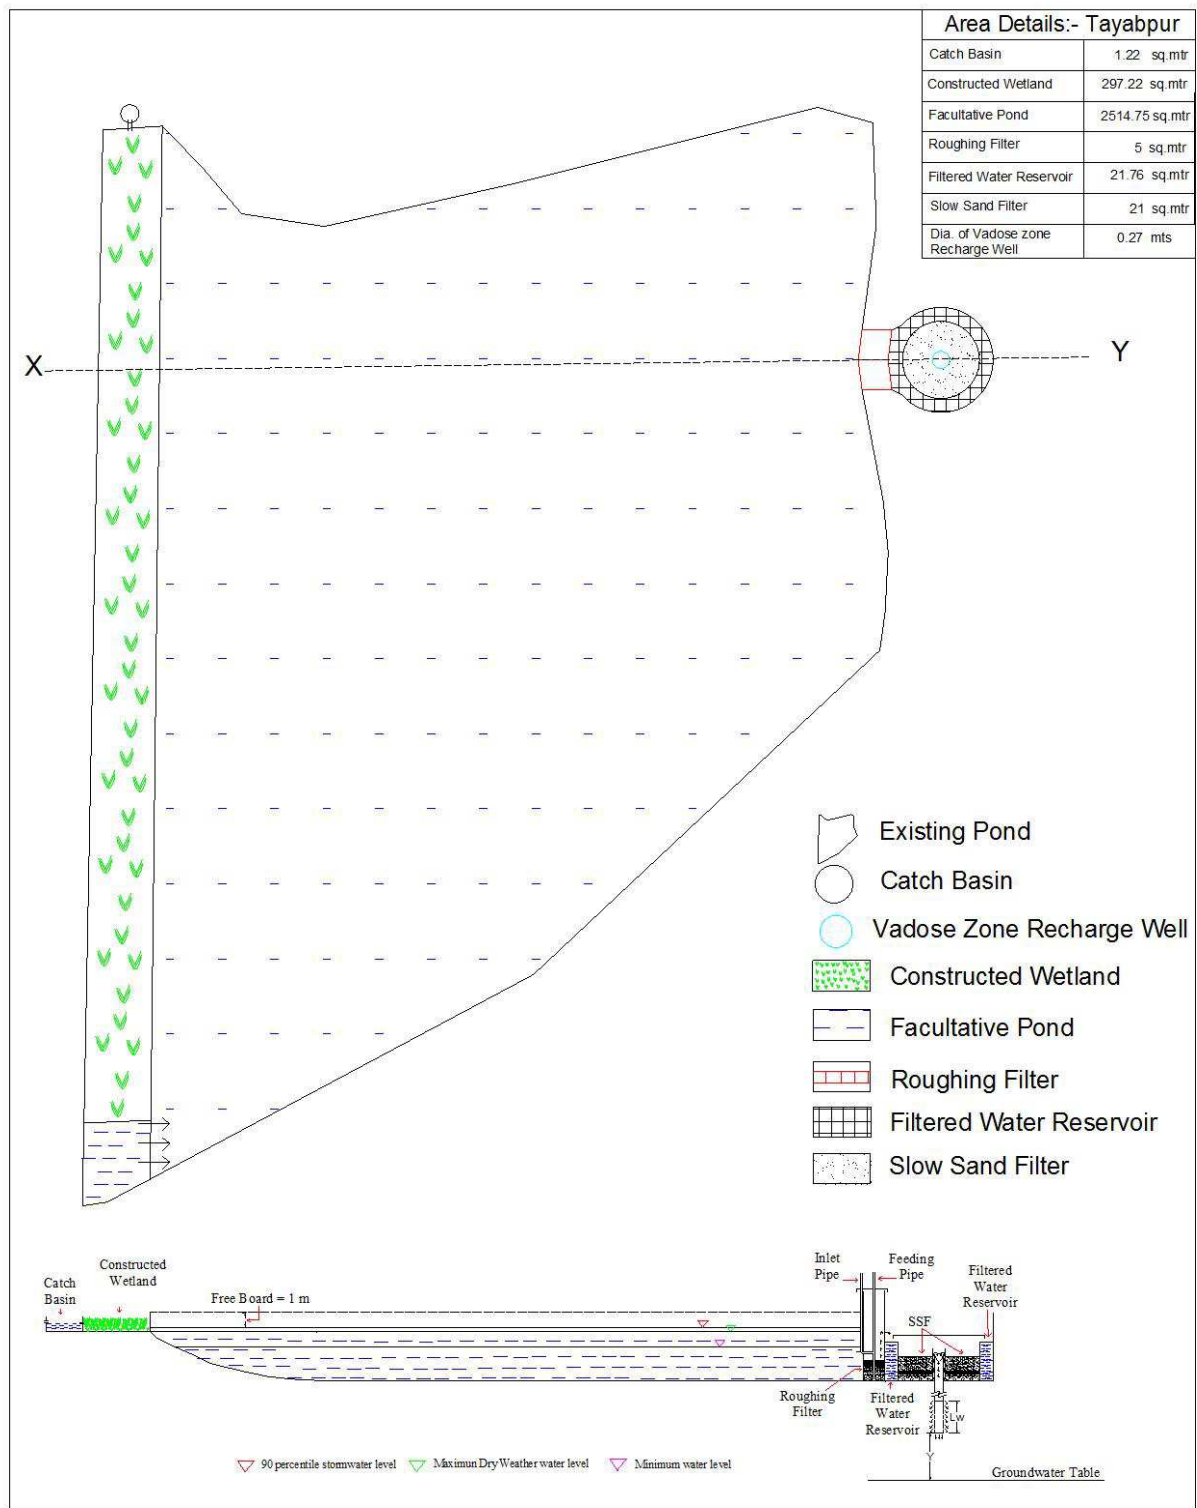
Plan and elevation view of Tayabpur village pond system
